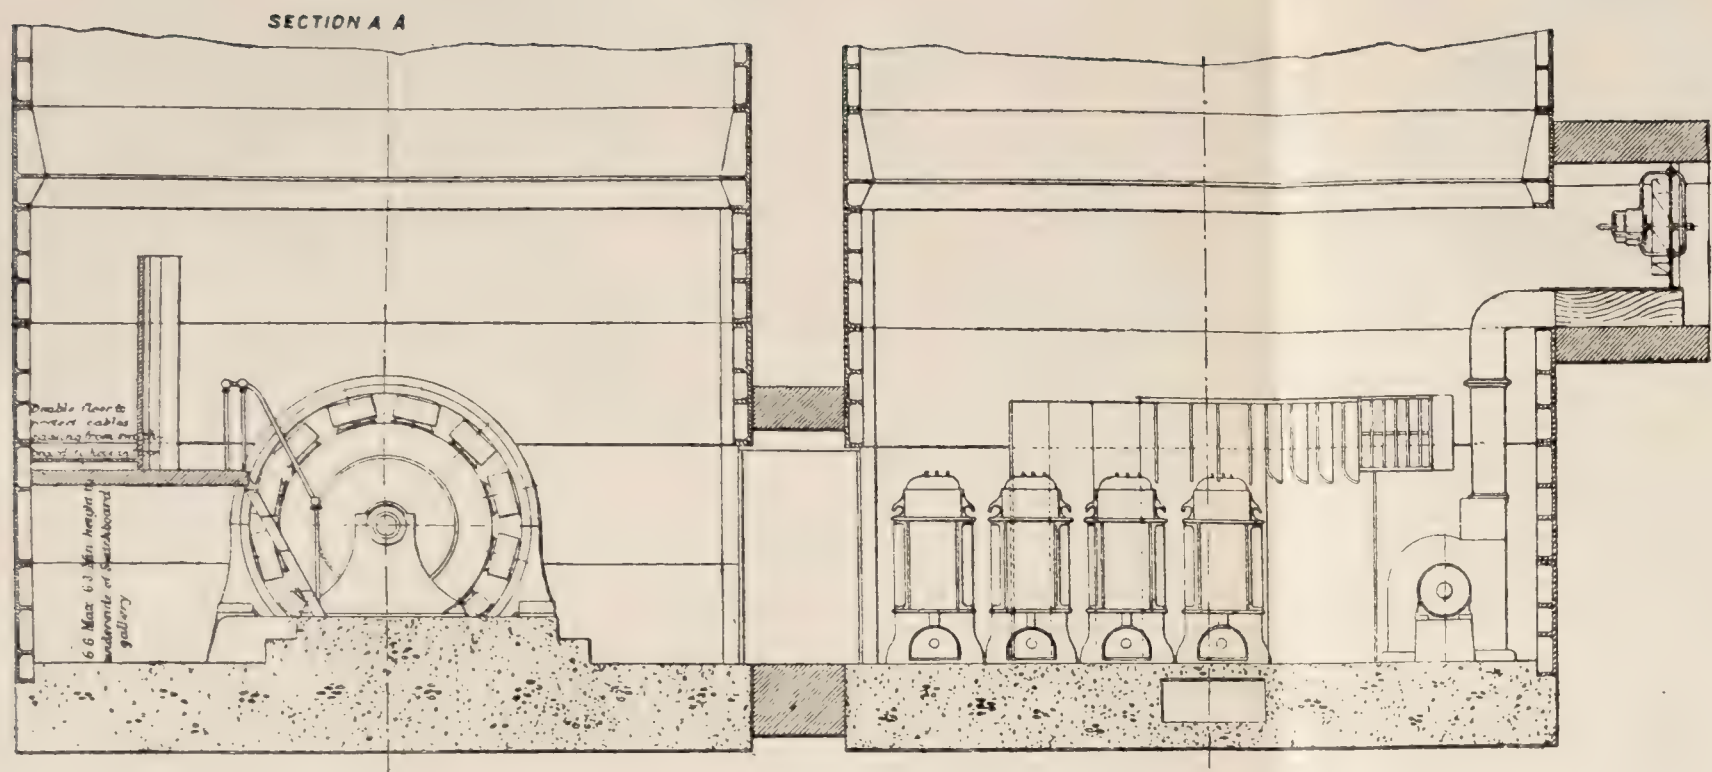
CENTRAL LONDON RAILWAY. GENERAL ARRANGEMENT OF MARBLE ARCH SUB-STATION.
